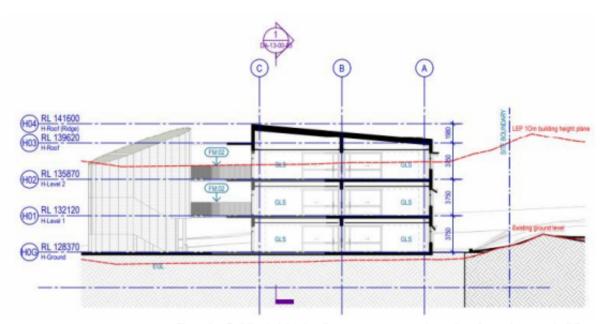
Building height plan diagram – -east-west axis section of new classroom building Source: Woods Bagot 2022
